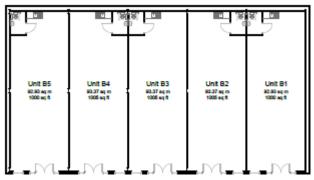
Typical Proposed Floor plans (Unit B shown)
